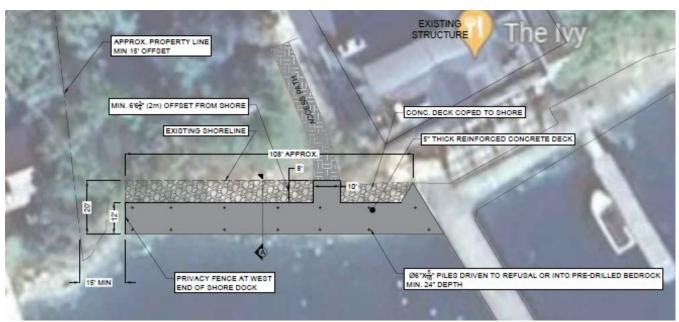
Concept Plan (Source: Kehoe Marine Construction Ltd.)
